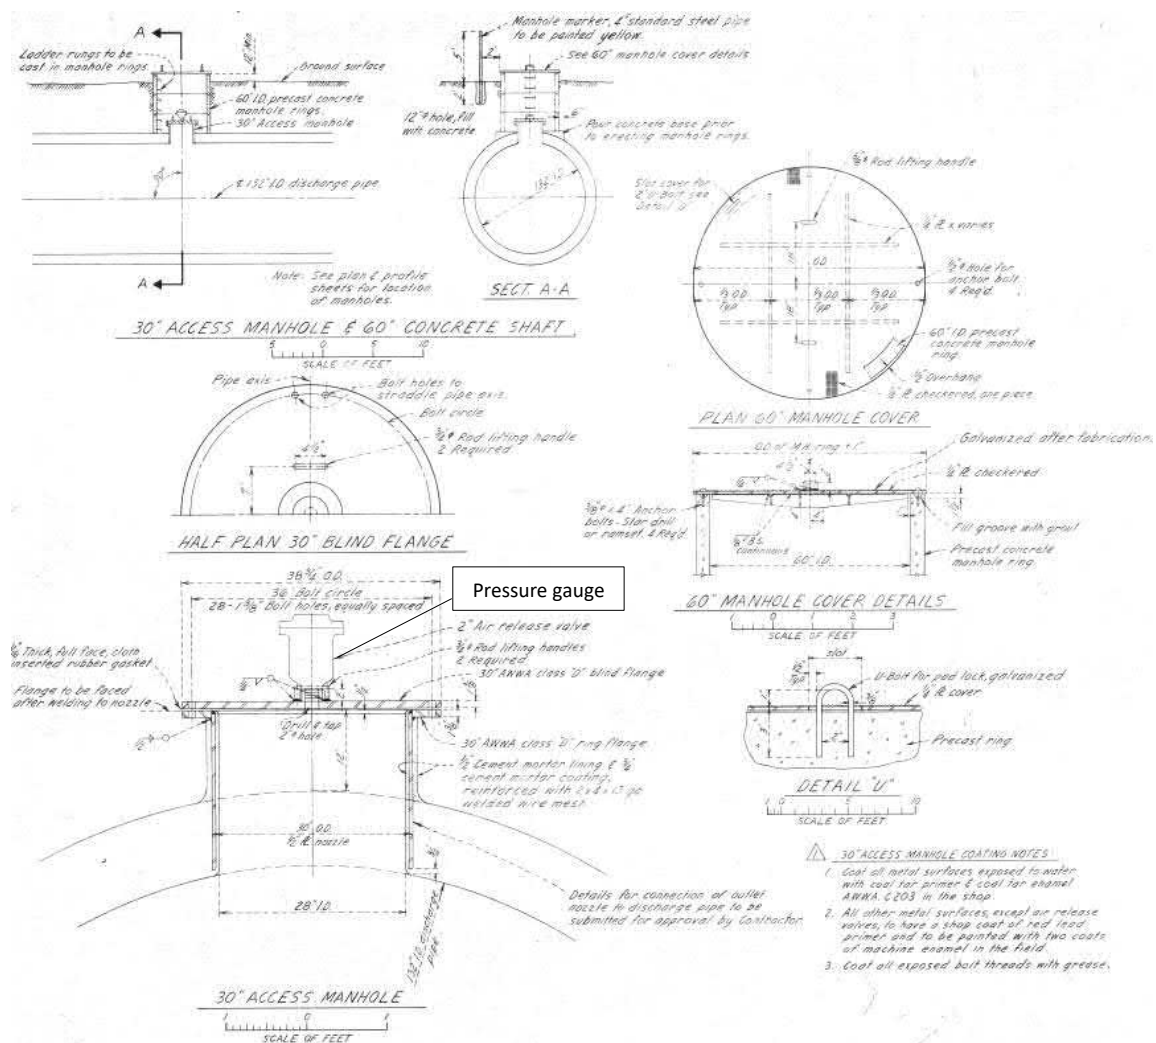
Forrest Frick Pipeline As-built Drawings of Access Manholes
